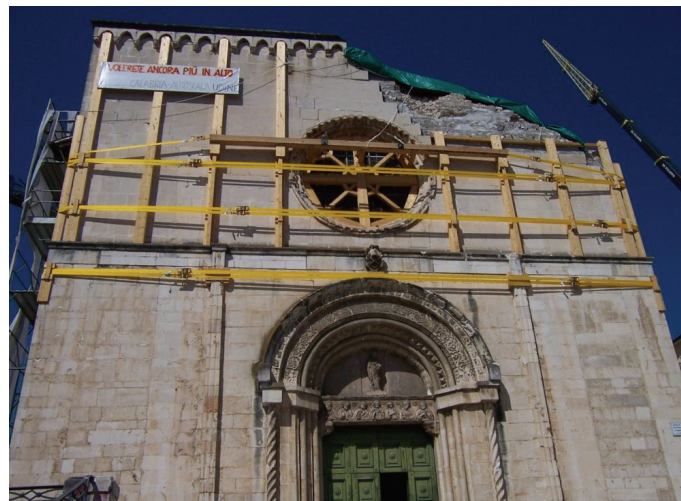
Belting the façade of S. Pietro da Coppito church (L'Aquila)
